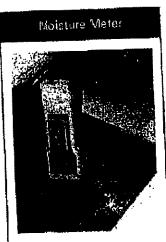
Moisture meter measuring moisture content of plywood subfloor
